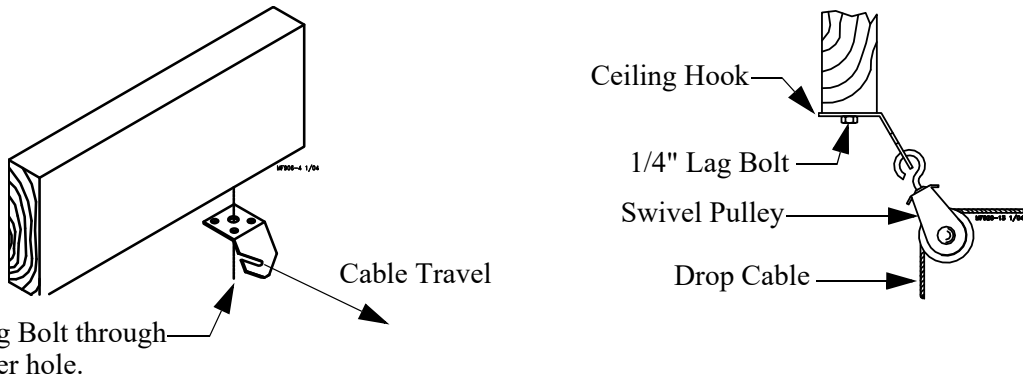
Wood Truss Ceiling Bracket and Pulley Installation
